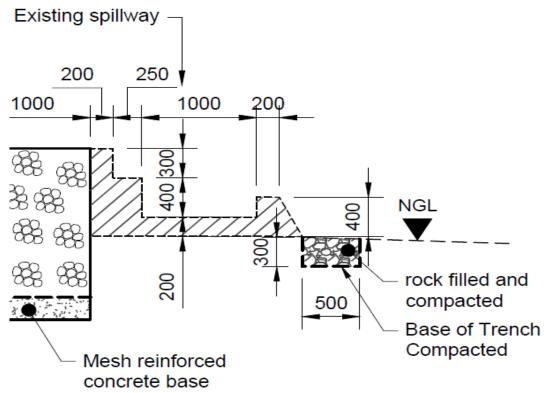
Schematic of spillway outfall protection - downstream remedial works
